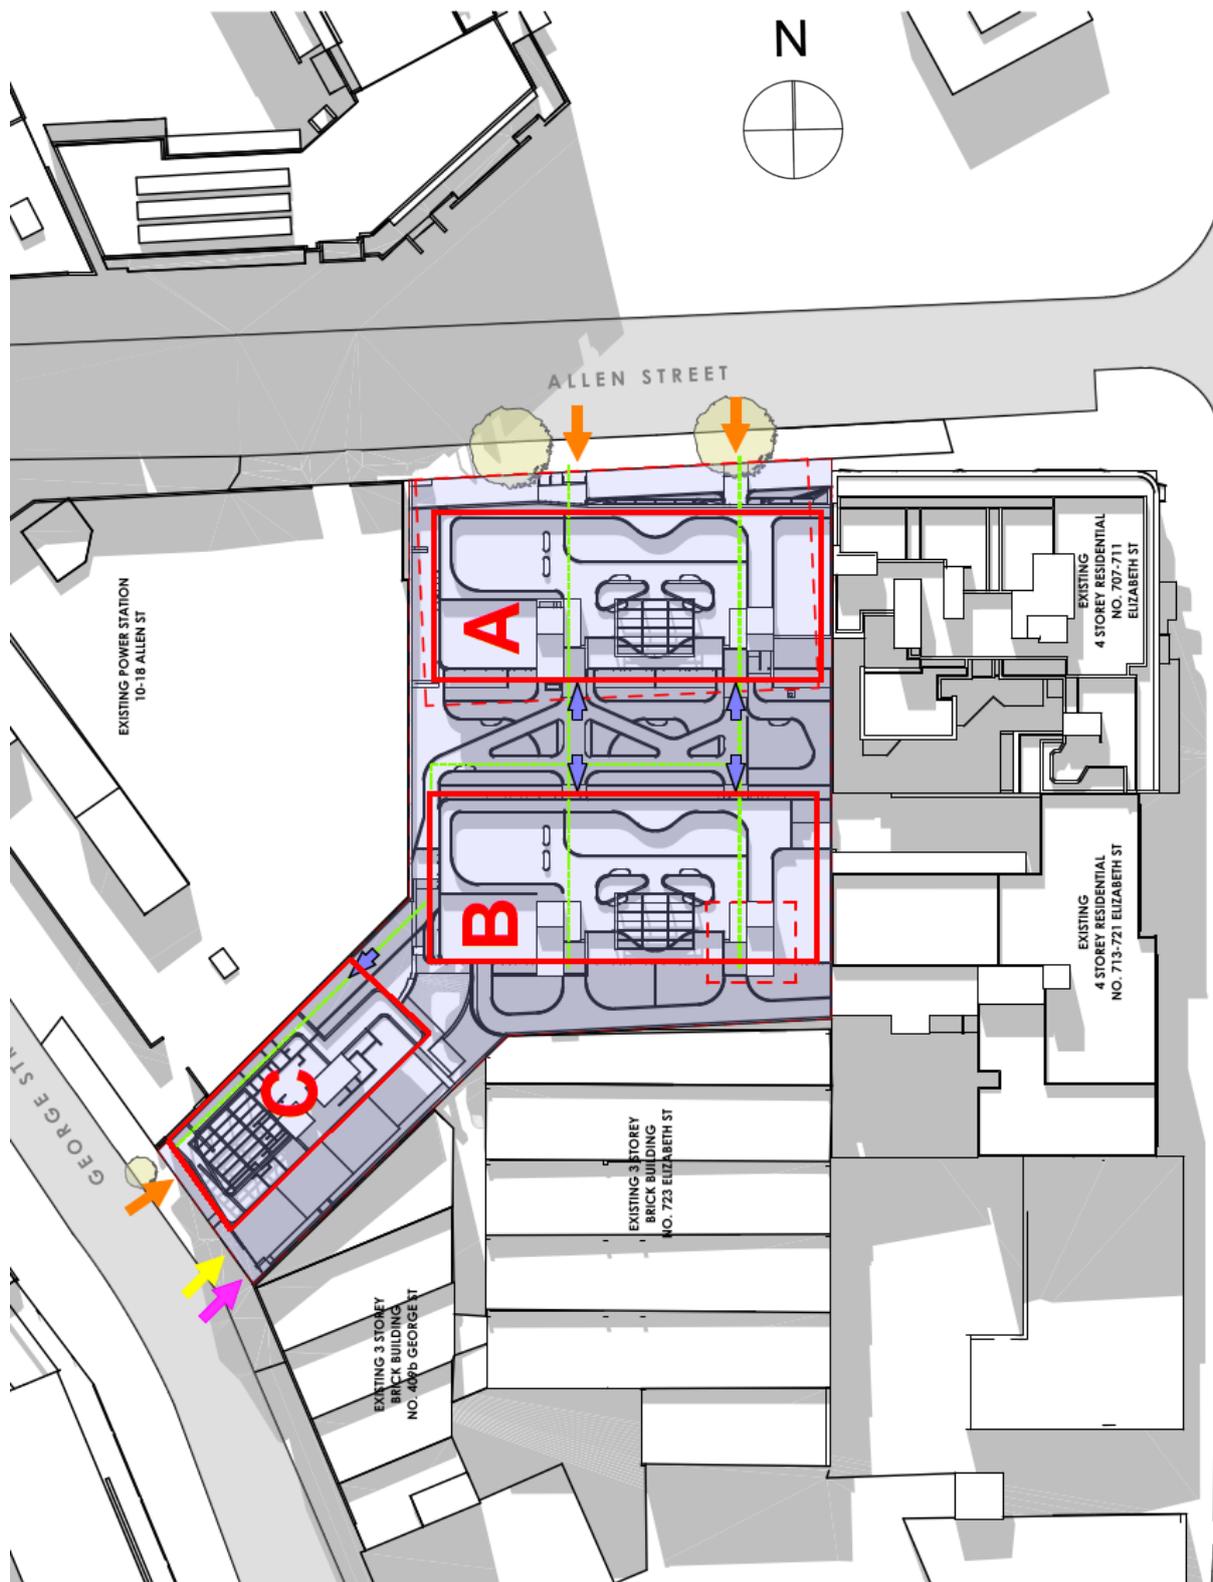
Proposed site plan, illustrating the footprints of Buildings A, B and C
